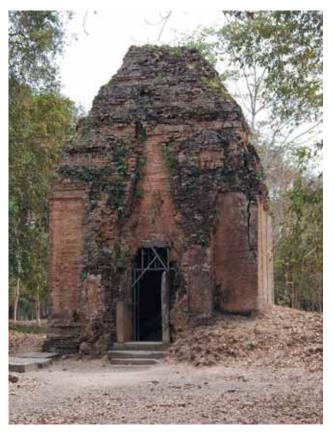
Crack at the corner of wall (N10 shrine in Prasat Sambor, M.20).
